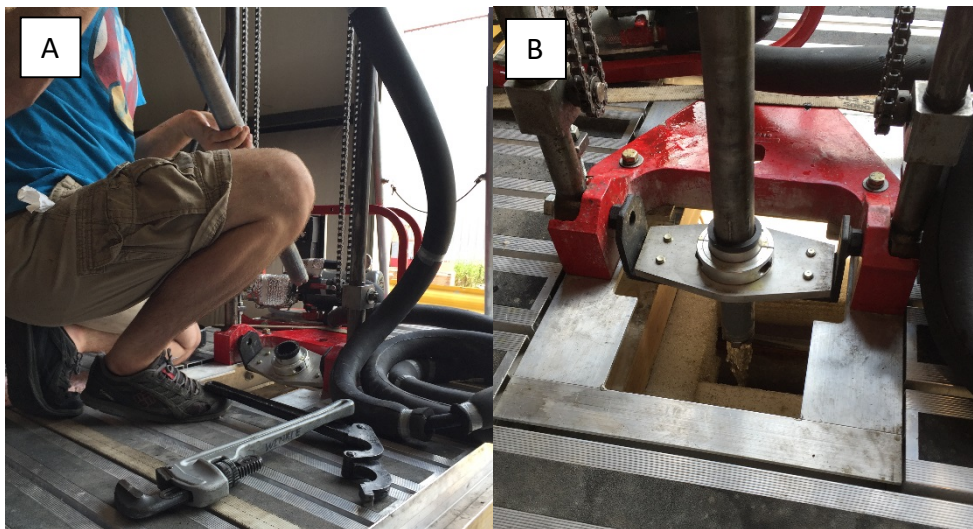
The first drill rod must be placed into the guide bearing. (A) The guide bearing rotates to facilitate assembly. (B) Assembled drill rod in vertical drilling position.
